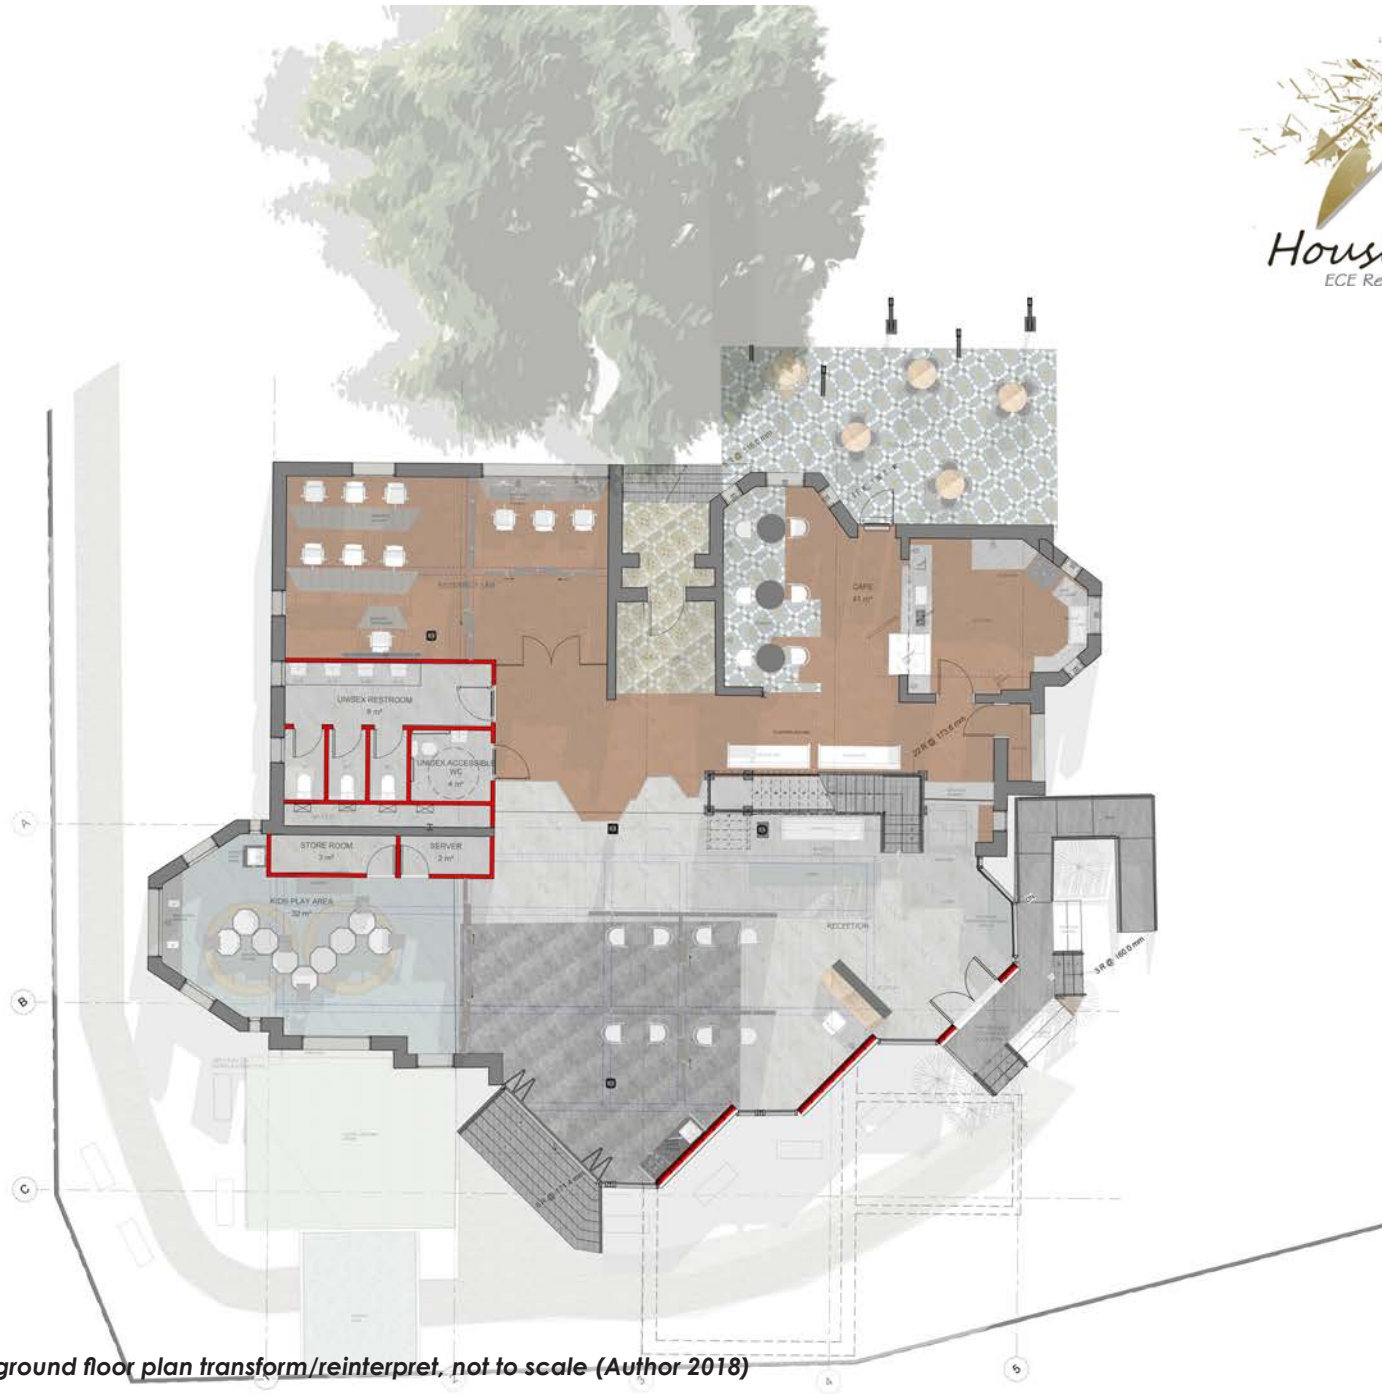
Final ground floor plan transform/reinterpret, not to scale (Author 2018)
